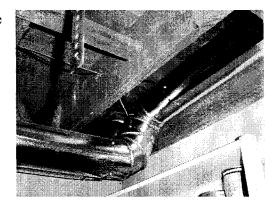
,008.jpg</u>, shows the warm-air supply to the main floor bathroom. The existing valve controlling an outdoor hose bib required the branch to be offset with a couple 45 deg. elbows.
